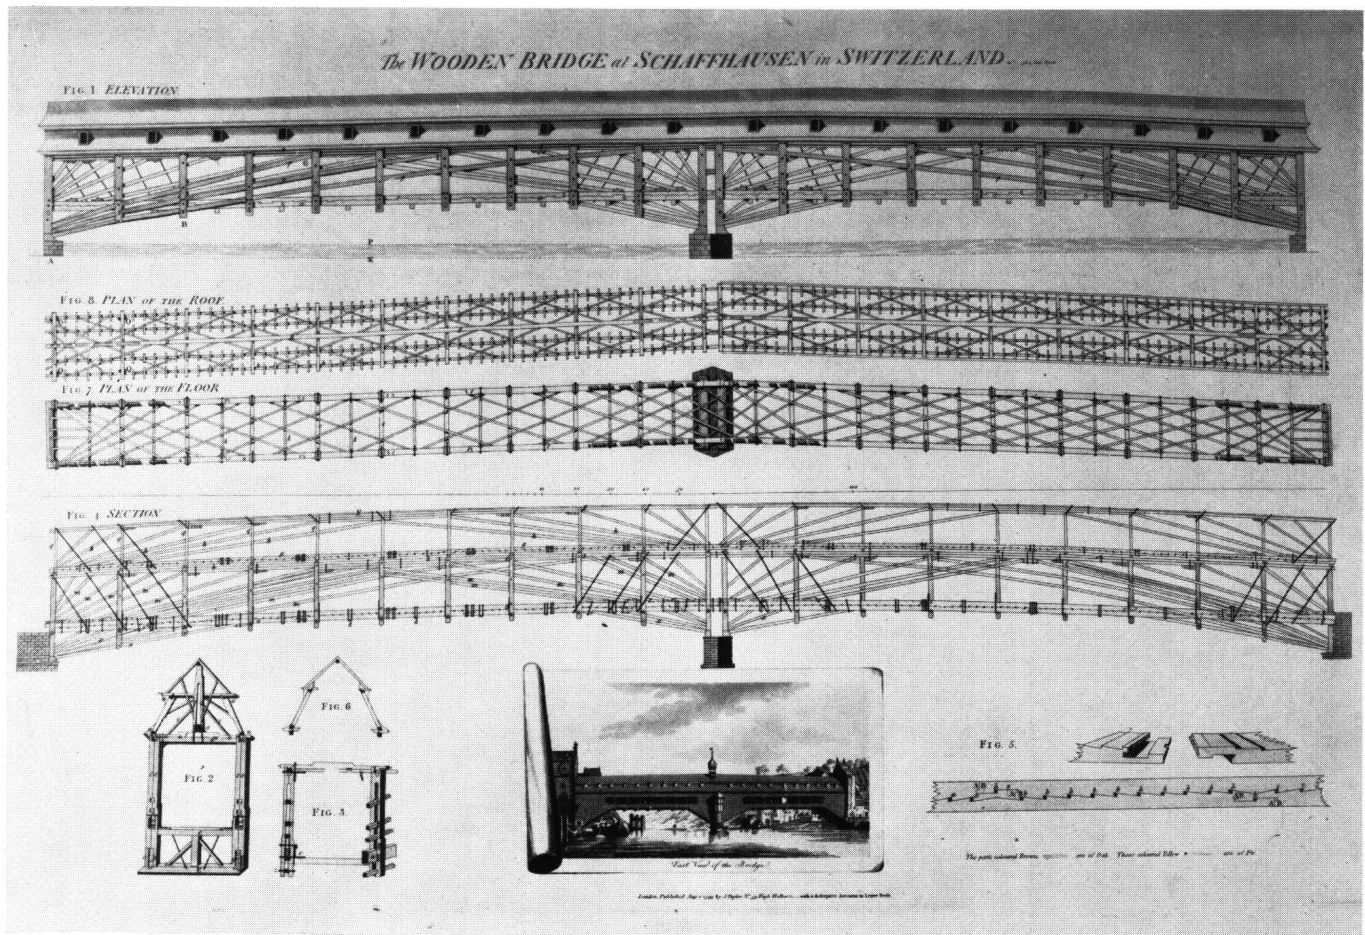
Bridge at Schaffhausen; print after Josiah Taylor showing plans, elevations, sections and details
